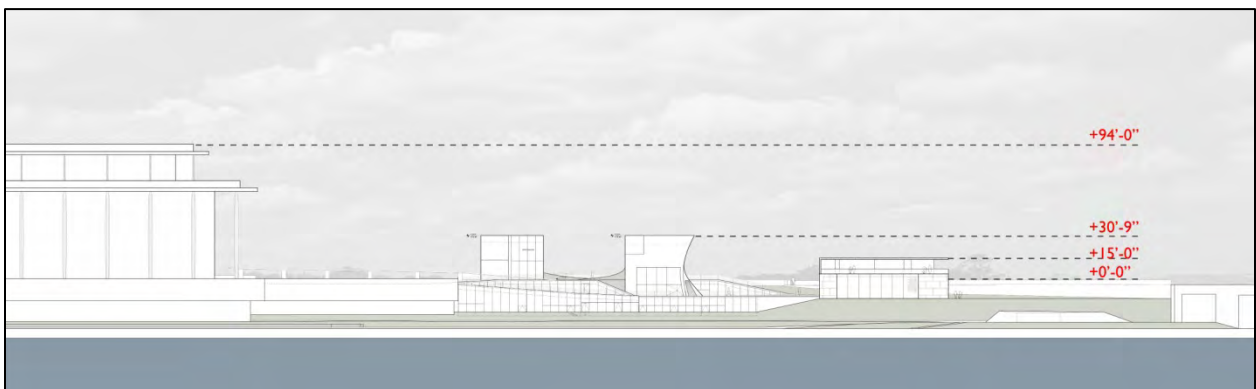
Alternative B – Three Land-Based Pavilions, section showing relative heights of existing building and pavilions.
